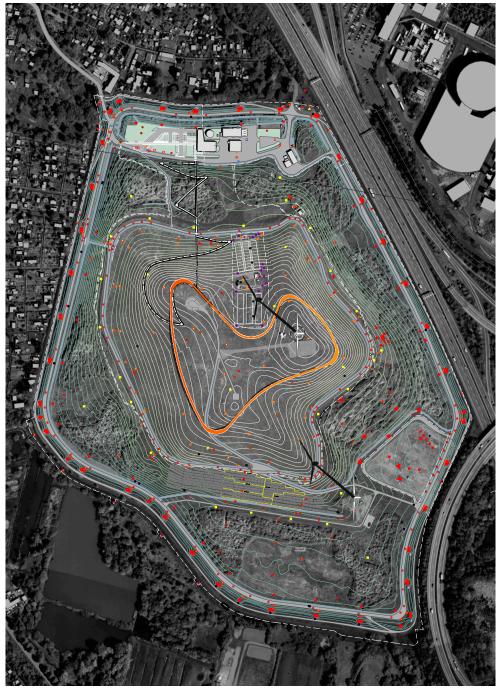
Layout of the Horizon Footpath (orange). To the north is the information centre
